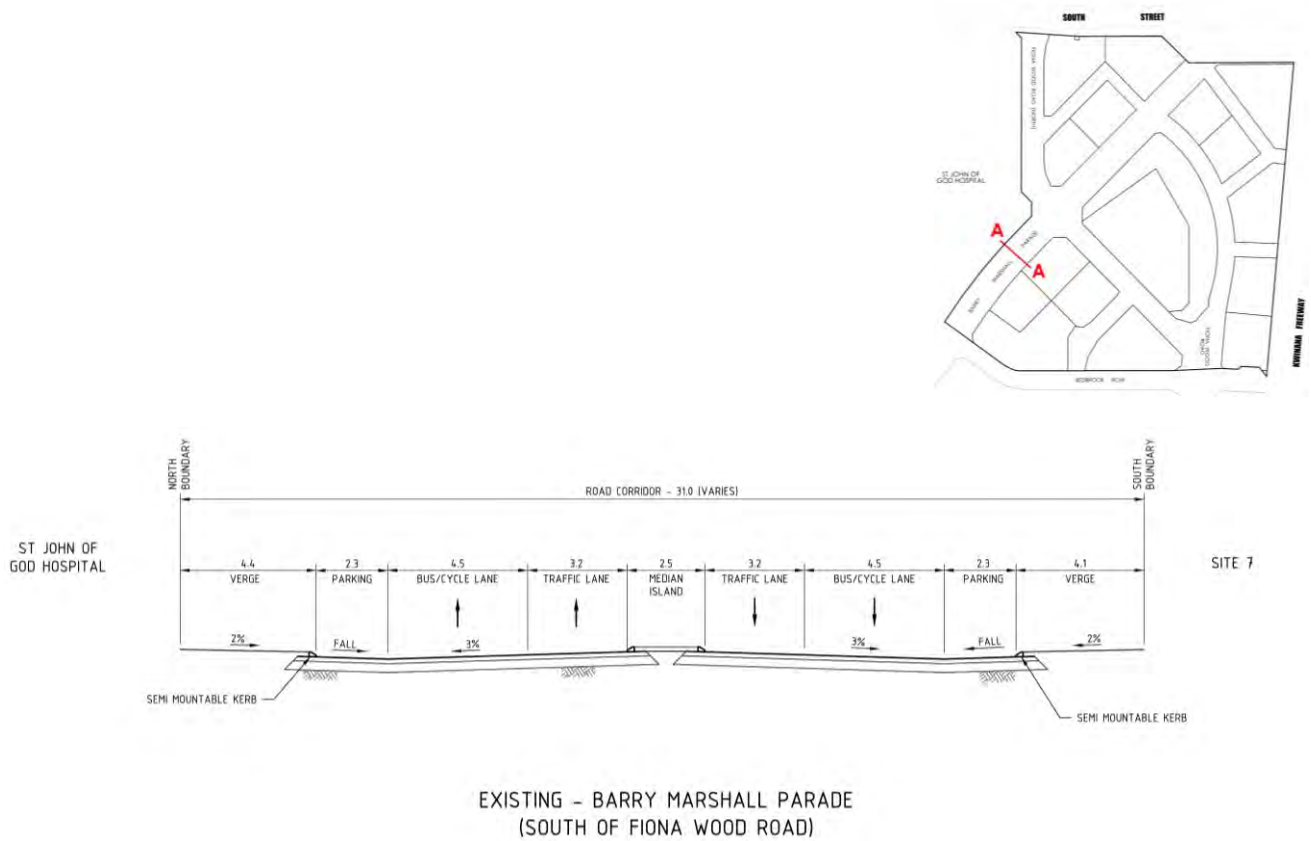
Section A-A Barry Marshall Parade (South of Fiona Wood Road)
